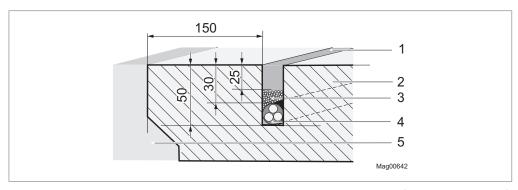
Installing an induction loop in bitumen, asphalt, or concrete (dimensions in mm)
